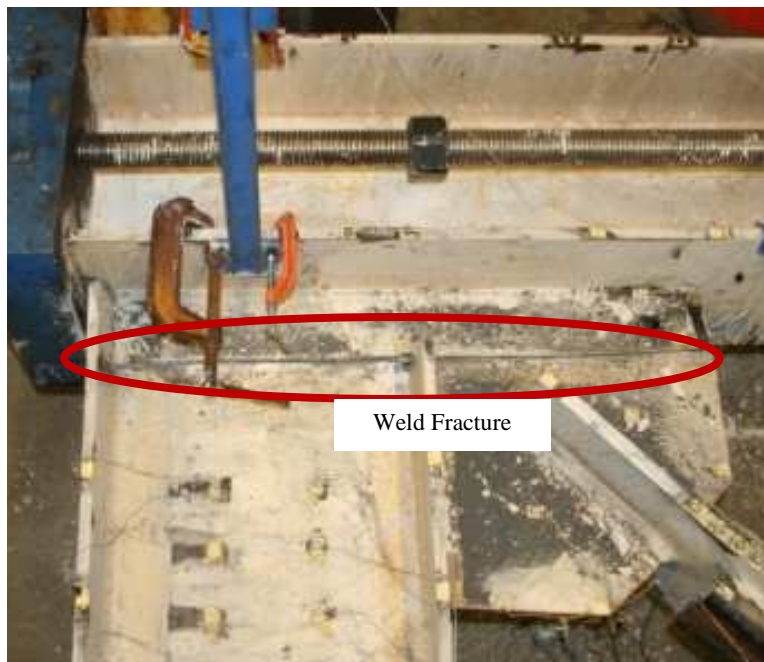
Fracture of North Shear Tab Weld
